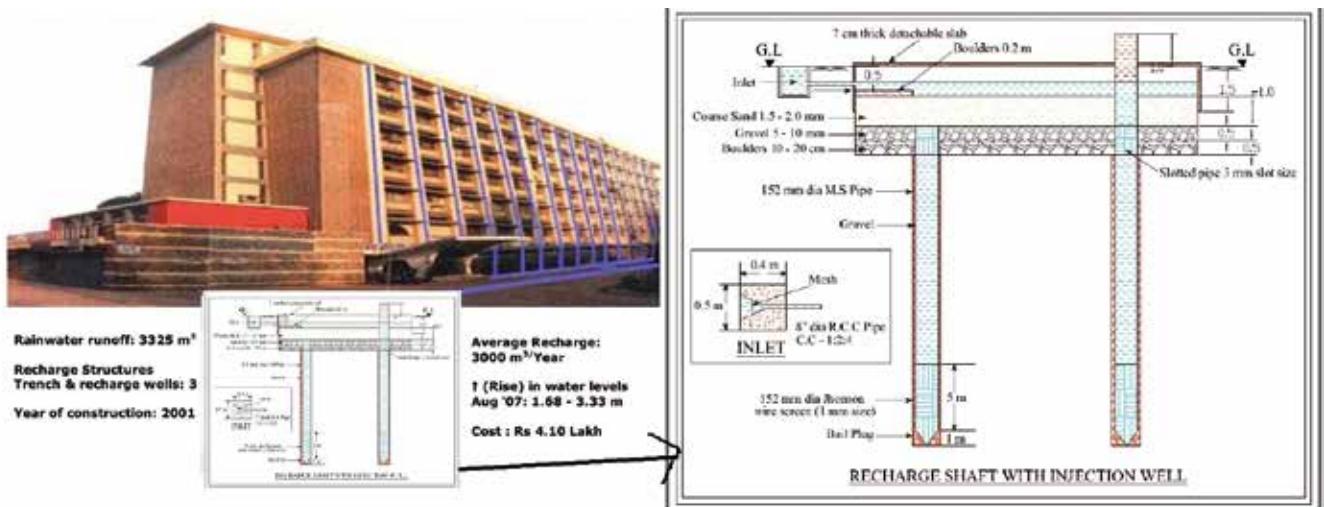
Roof-top rainwater harvesting structure for groundwater recharge in Sham Shakti Bhawan, New Delhi.
